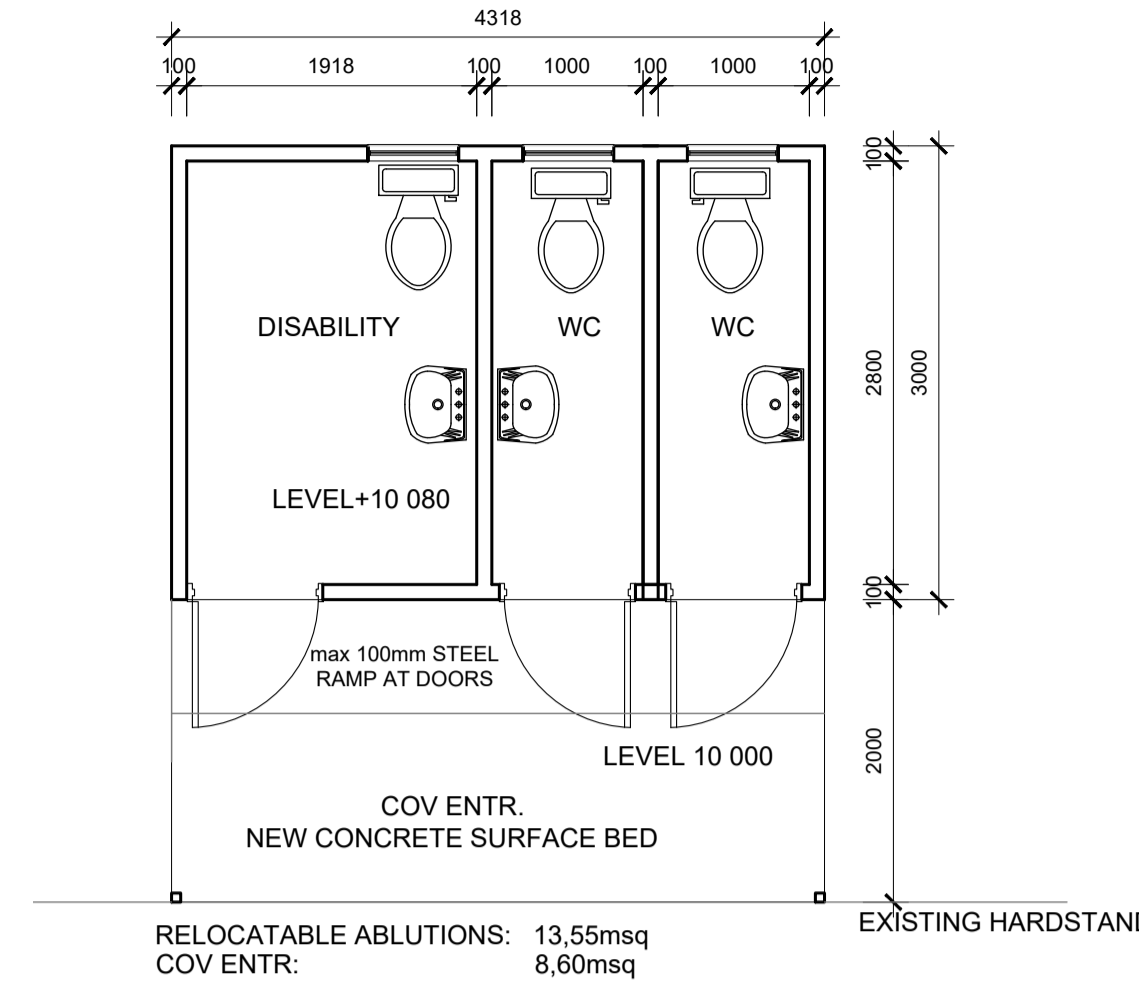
Plan and elevation of a typical facility with a close-coupled toilet system
